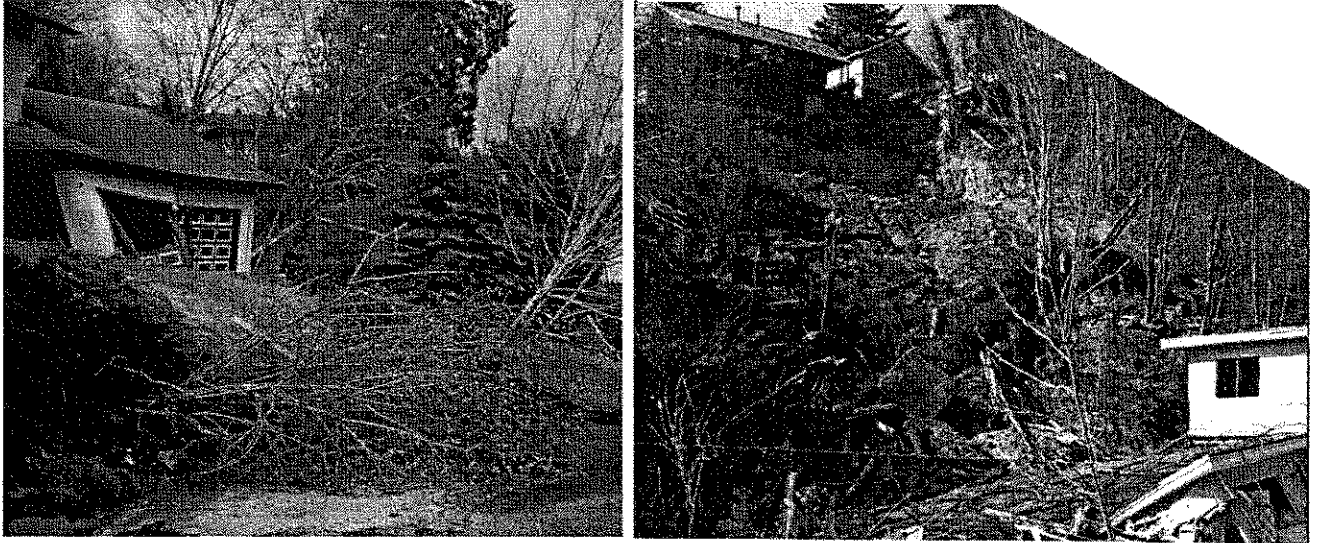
a) House damaged as a result of being situated on a re-activated landslide, Kelso, WA. b) House damaged by a debris avalanche from an adjacent slope (White Rock, B.C.)
